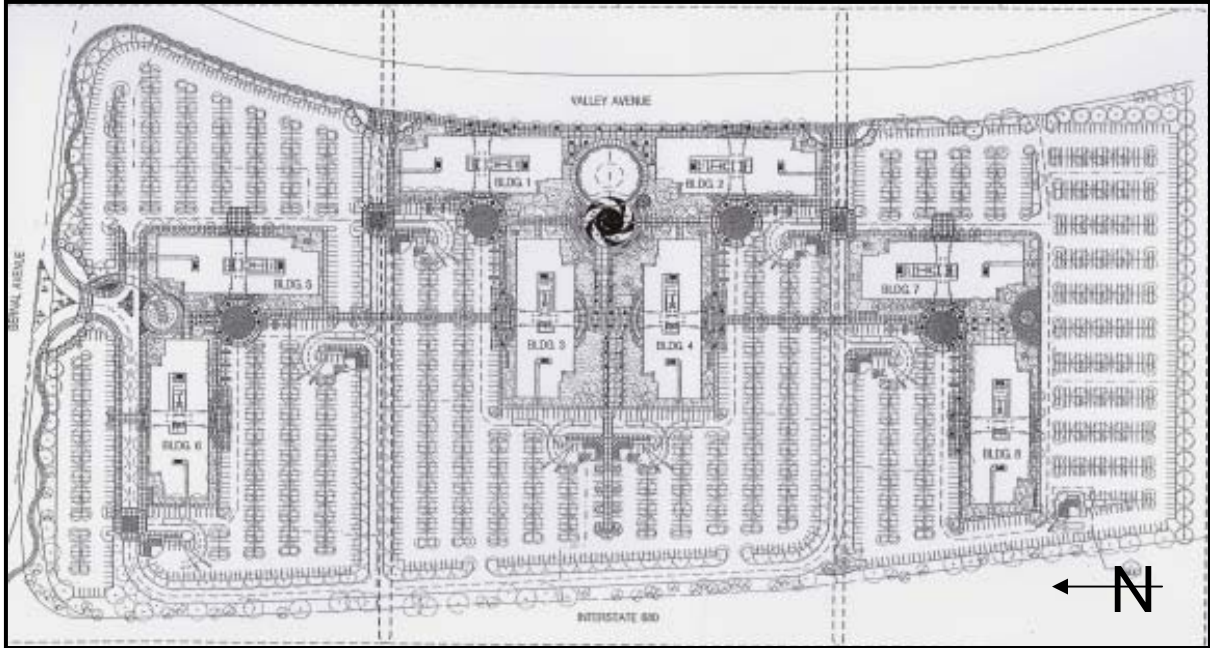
Approved PUD Development Plan for the Pleasanton Gateway site.
